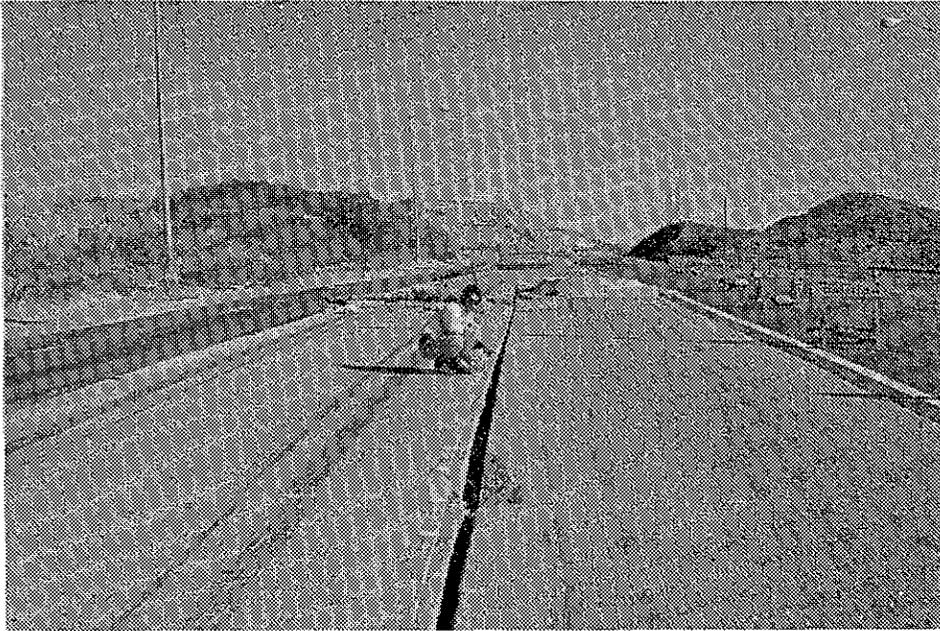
Slab separation along longitudinal joint due to lateral fill movement.
